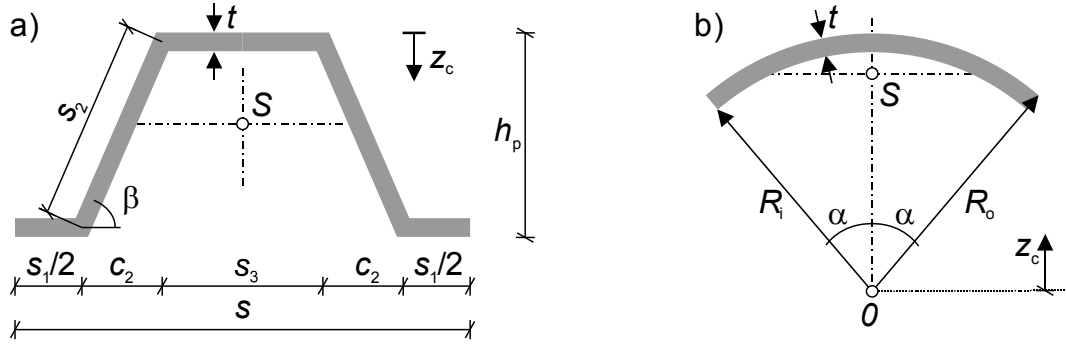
Examples of folded plate and cylindrical-shaped facings
